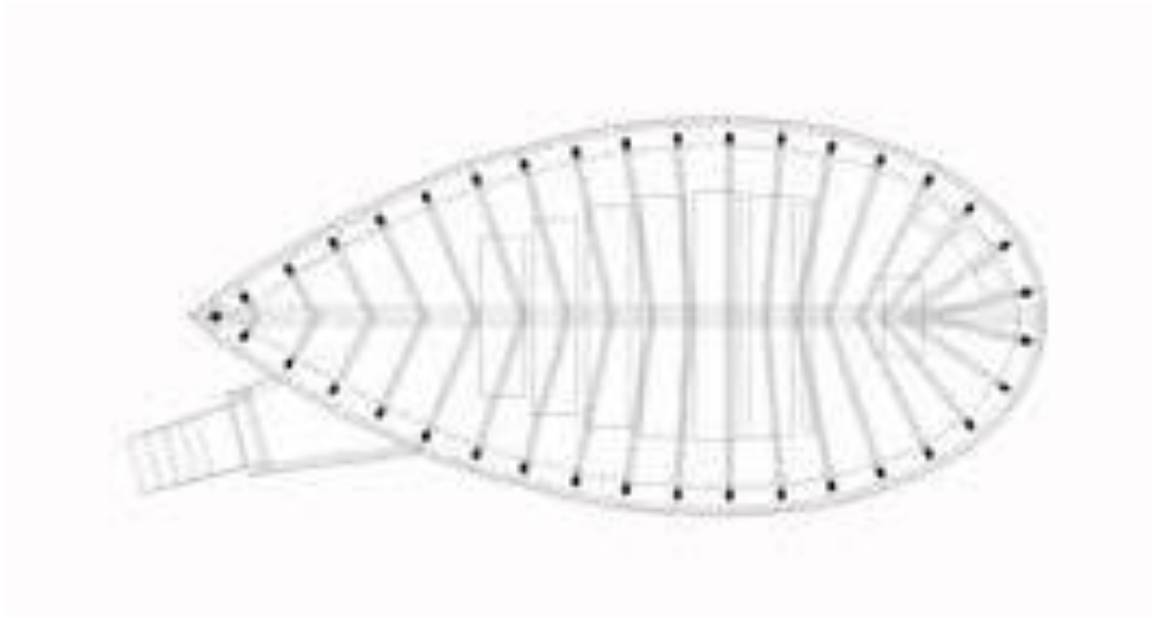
Floor Plan. (Source: Kalvelage, 2016)
